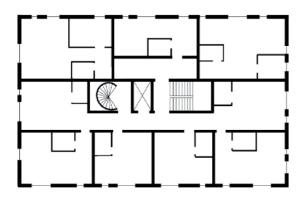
HOAS Tuuliniity typical floor plan (drawn by Emre ILGIN).
